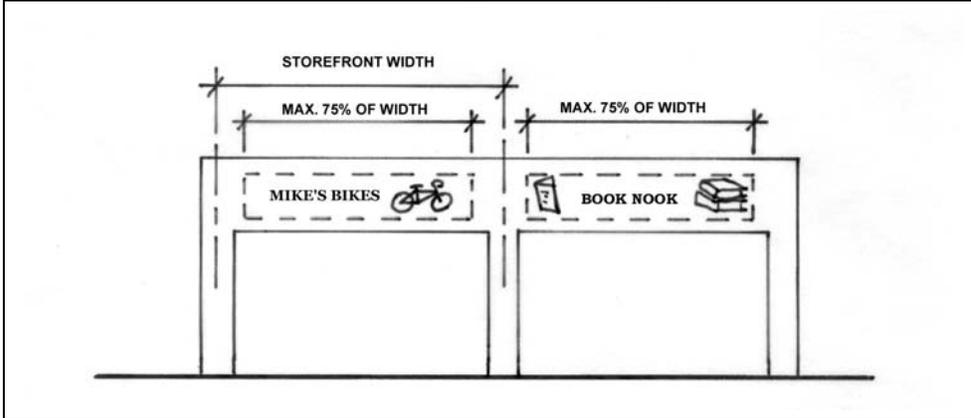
Multi-Tenant Building-Mounted Sign
